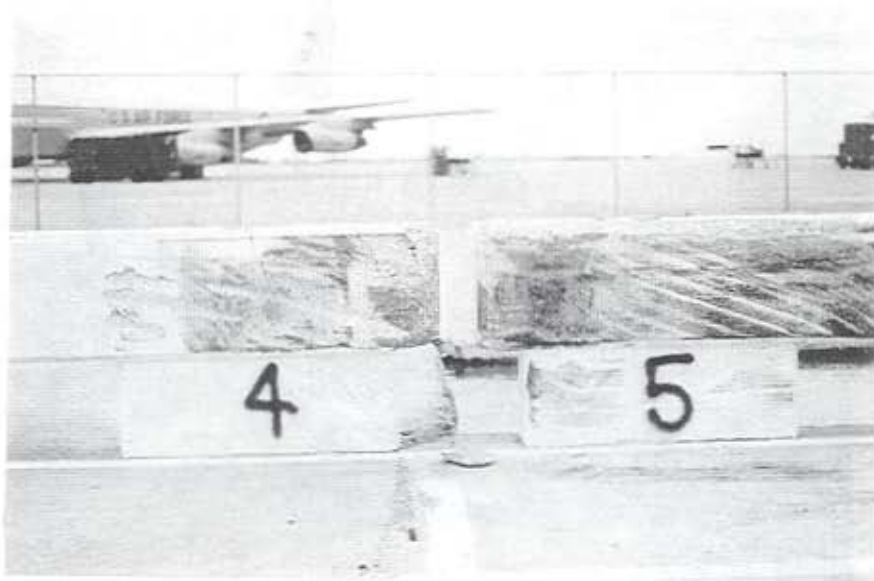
Bridge Rail Damage, Test NEOCR-3
